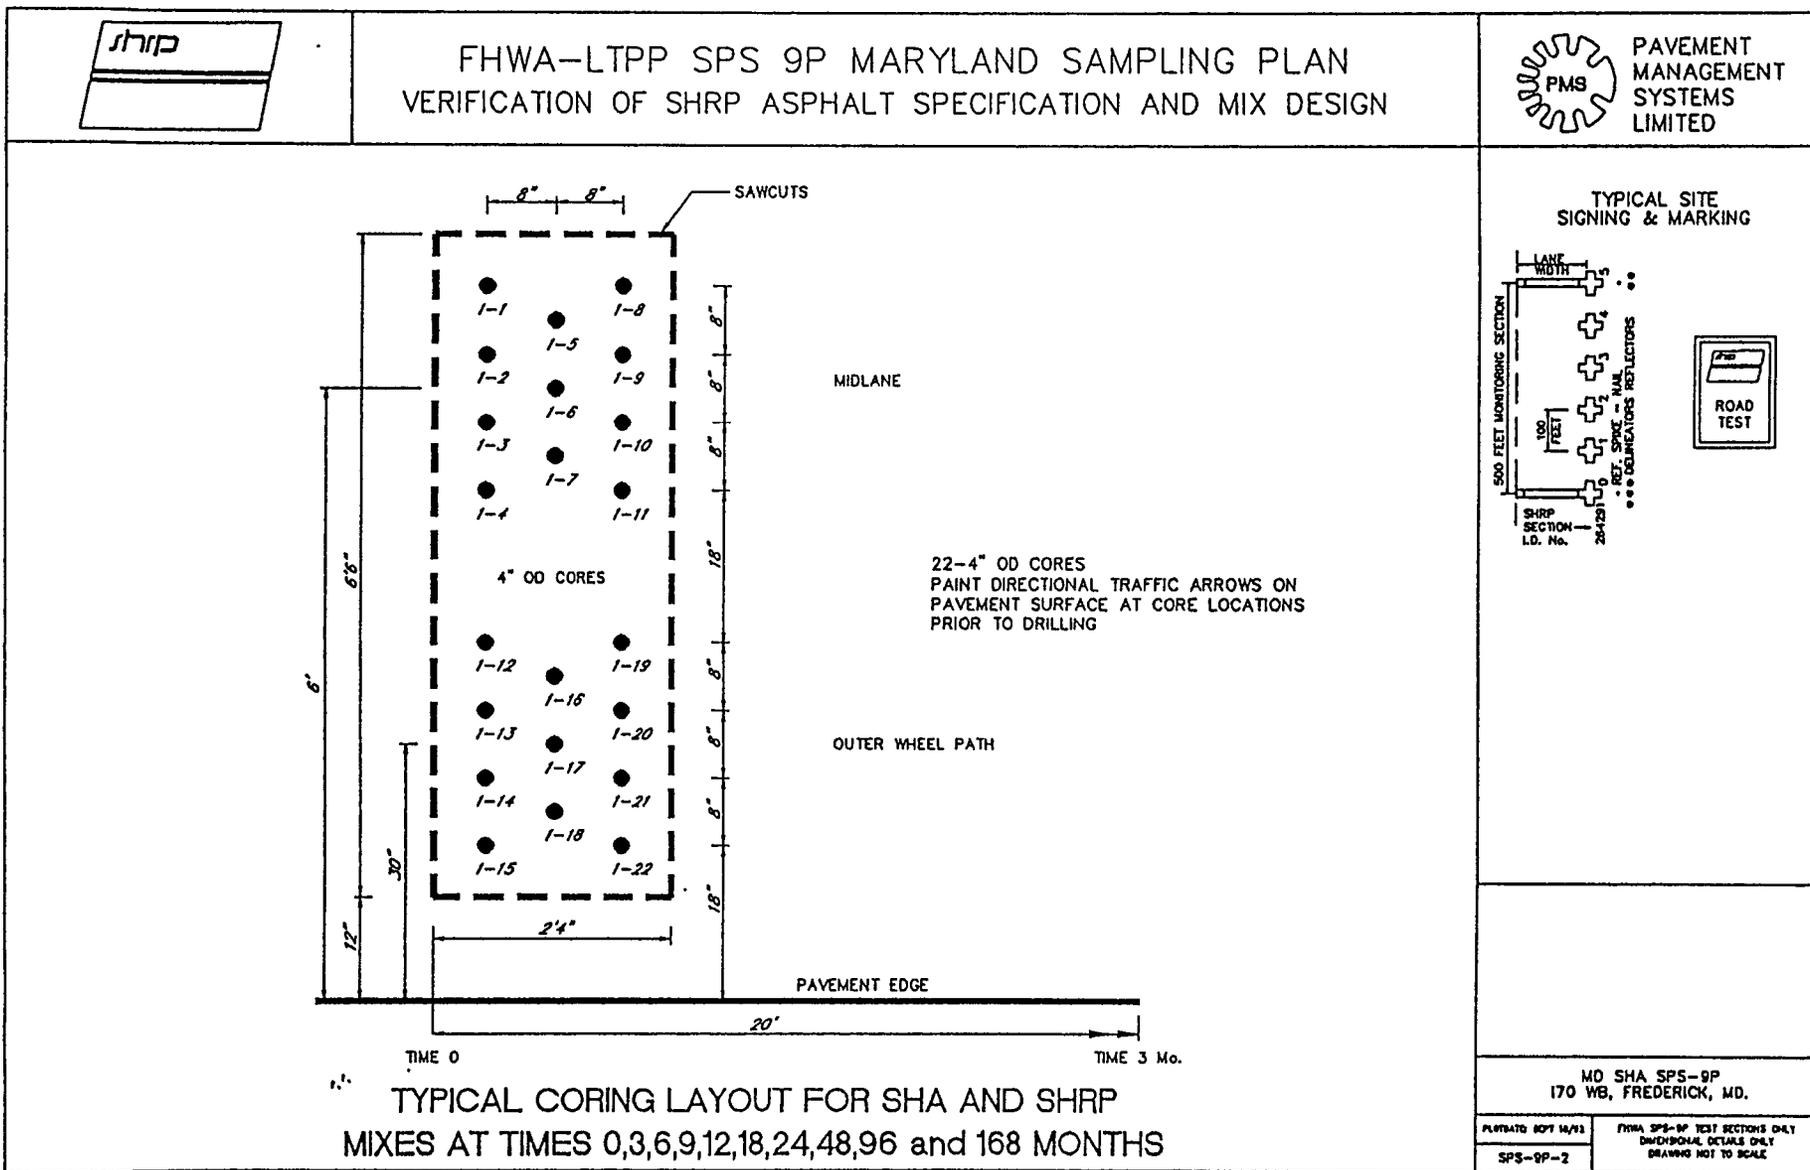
Typical Coring Layout For SHA And SHRP Mixes At Various Times After Construction
